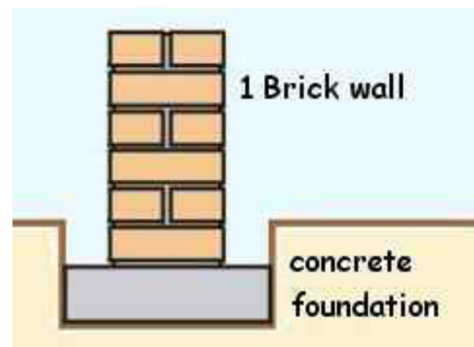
Simple strip foundation (<http://www.bne.uwe.ac.uk>)
